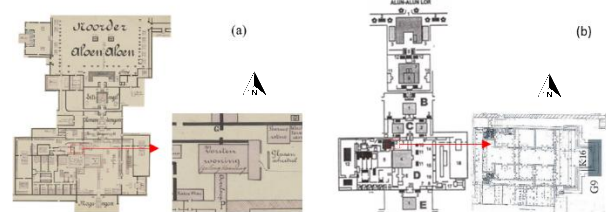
(a) Plan of Gedhong Jene in 1830, (b) Current plan of Gedhong Jene
